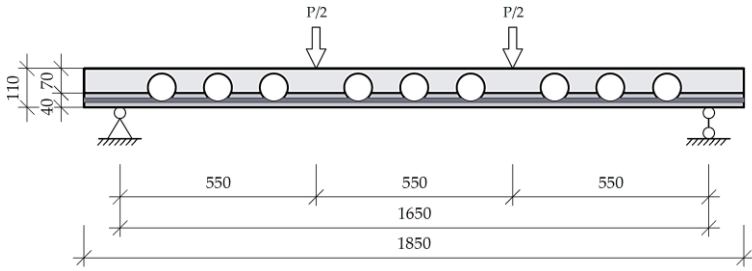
Experimental test arrangement of layered specimen (M. Ibrahim, 2019)
